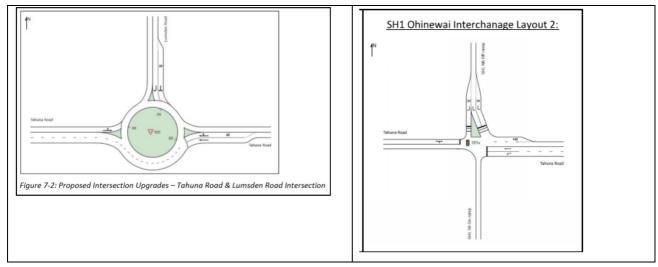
Sidra layout diagrams for layout 2 improvements (Scenario 2.2 and 4.2) (snipped from the ITA Figures 7-1 and 7-2). The Ohinewai interchange layout is the eastern intersection.
